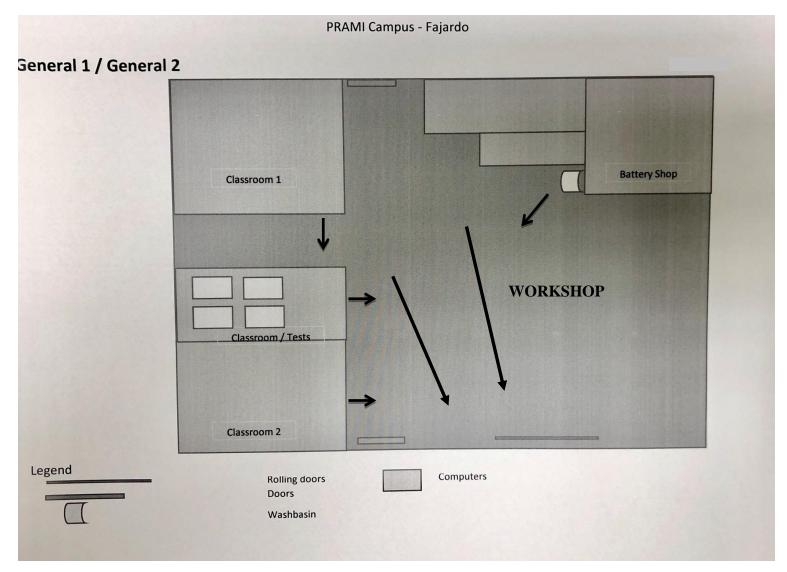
Emergency Exit Plan, Building C-2, First floor General Classrooms (C-104)
